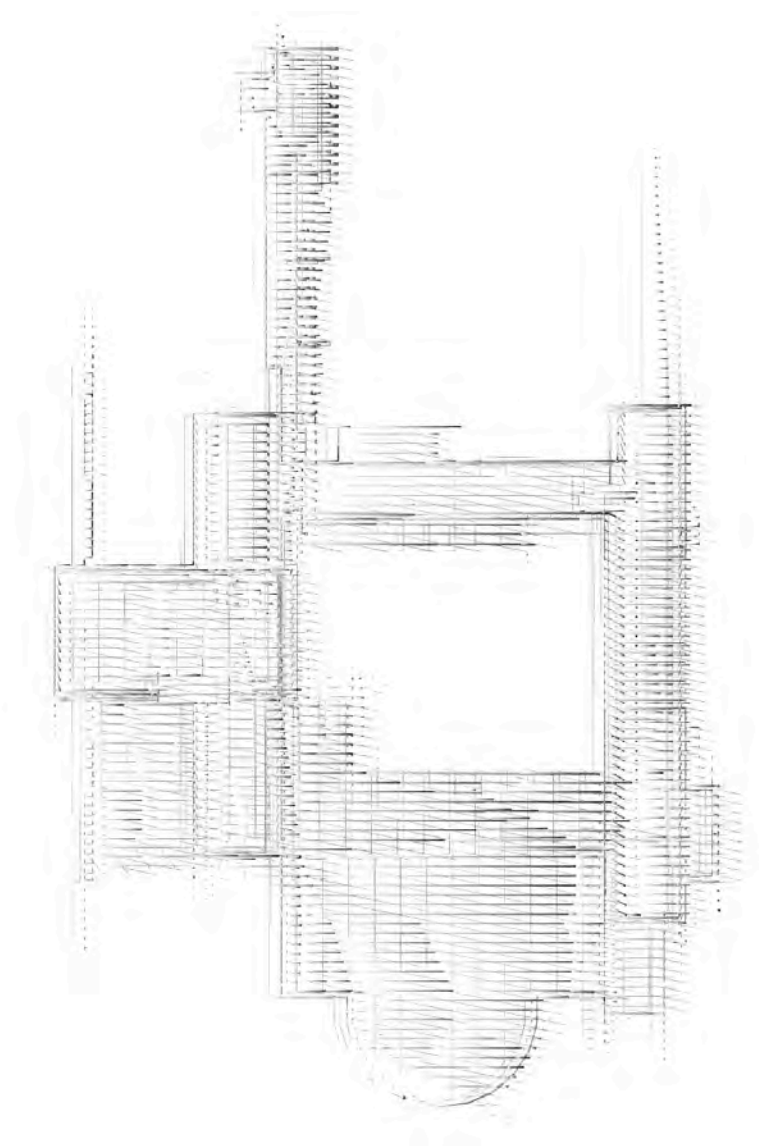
Resulting archimetical plan drawing of the Hollyhock House
